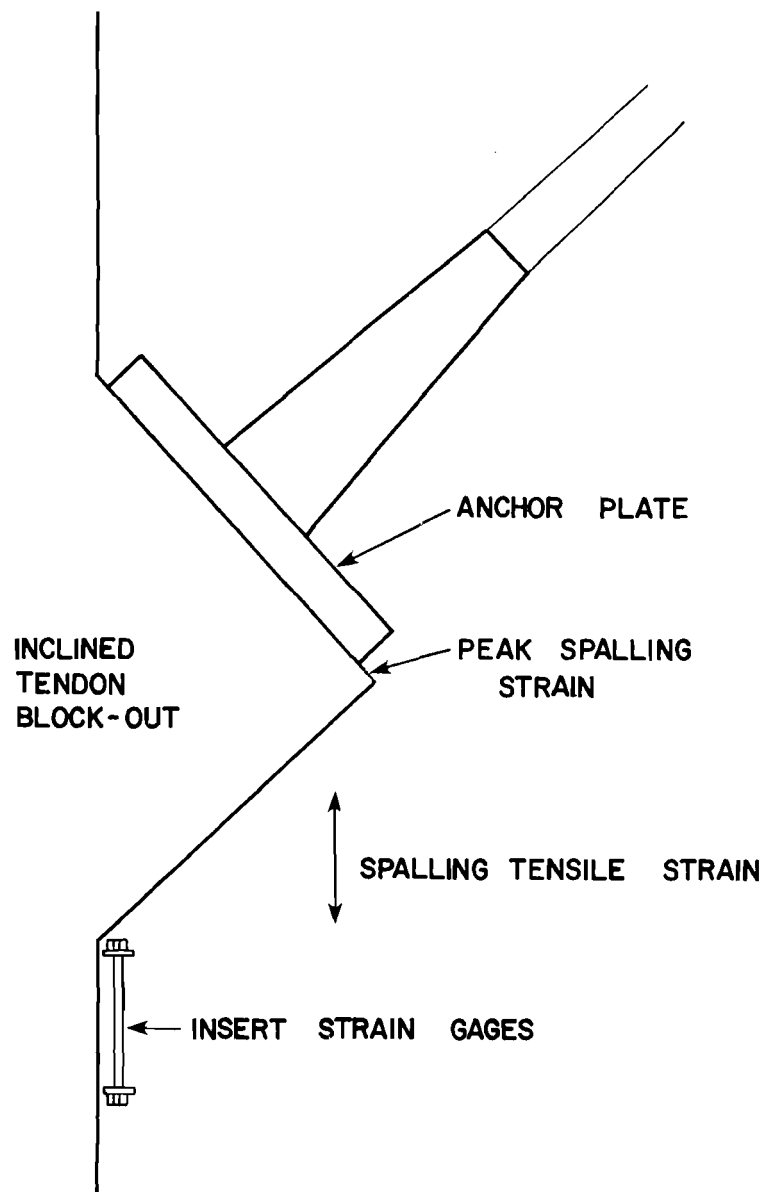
Location of maximum spalling strain for inclined tendon specimens
